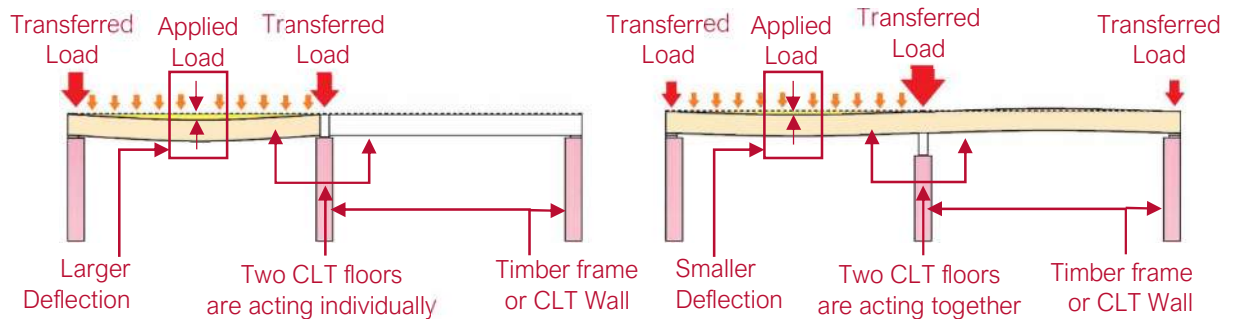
Comparison of deflections between single and double span CLT panels for roof or floor applications ^[21].
